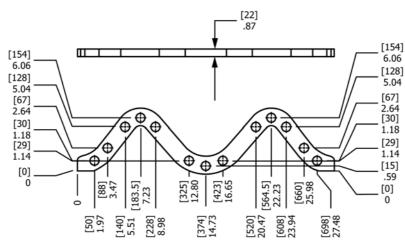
Flange Details for Longitudinal Seams in Structural Plate with Flange Connections
